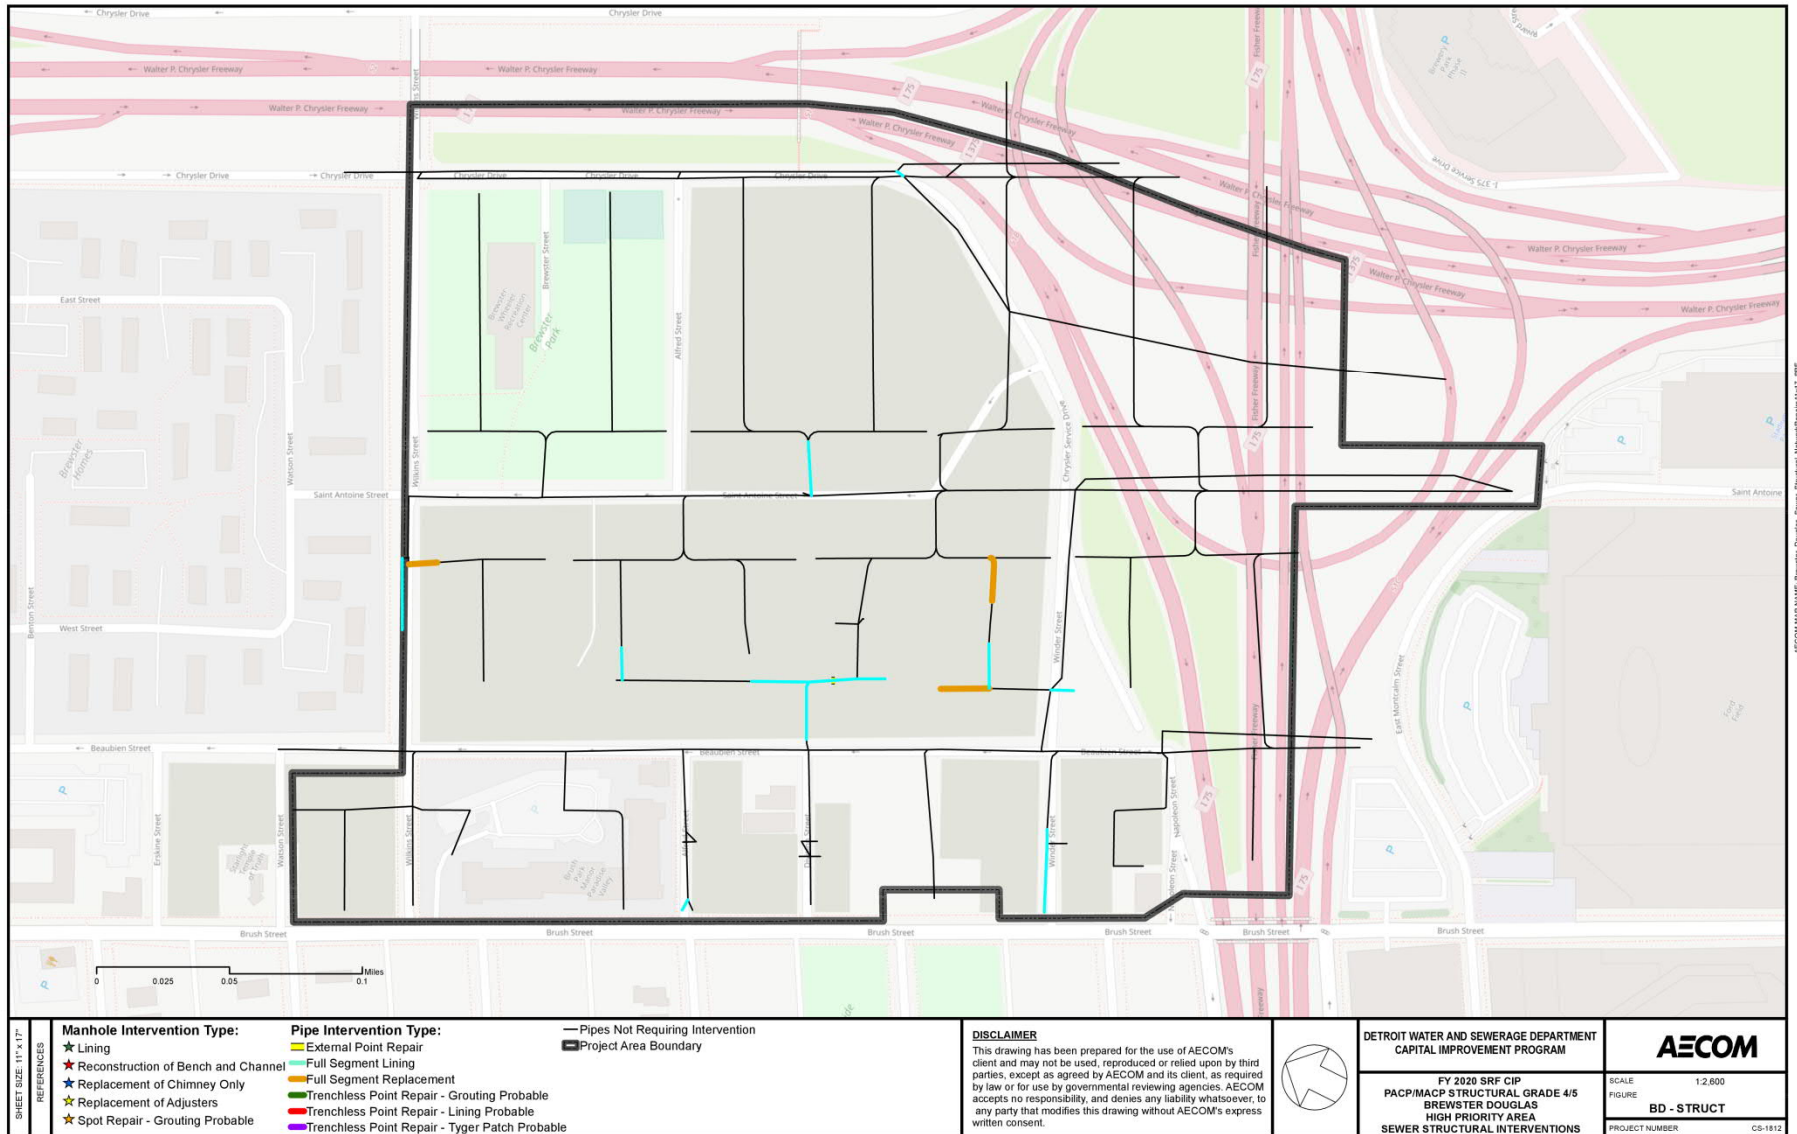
Brewster – Douglas Sewer Structural Network Repairs
